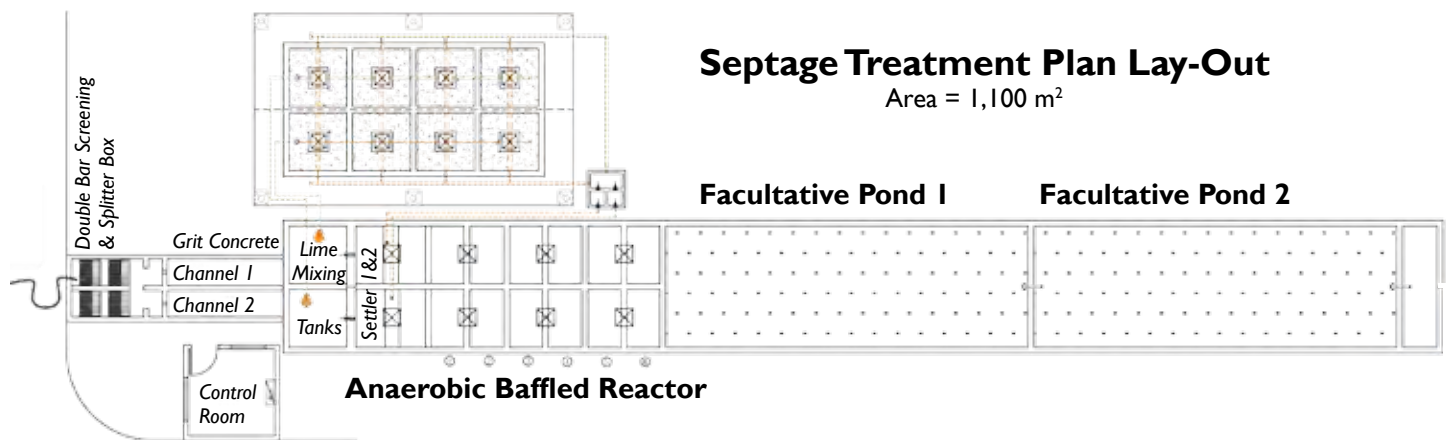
Initial site plan drawing for a hypothetical septage treatment facility.
